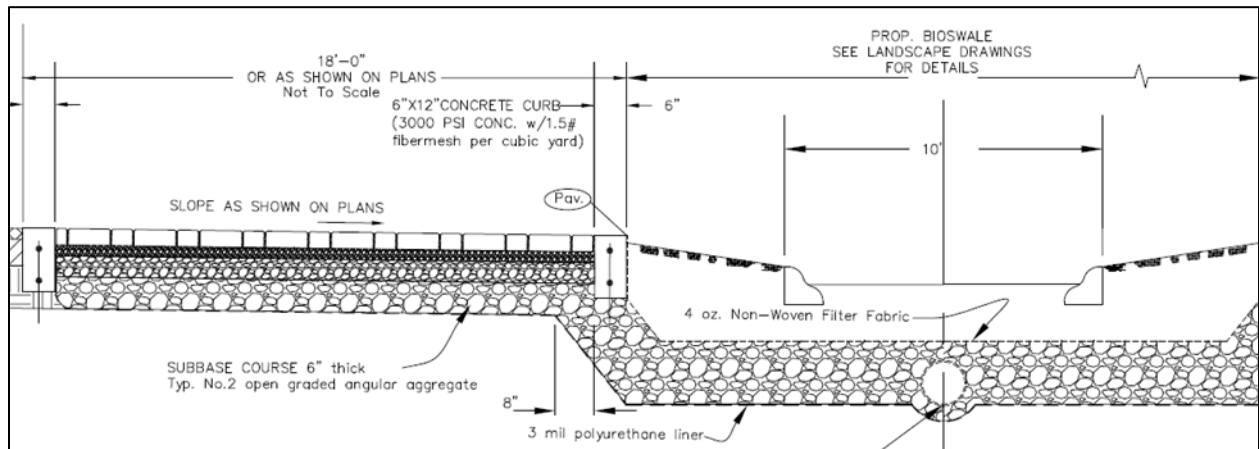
Bioswale cross section at CCDD#1 Cascade Park
